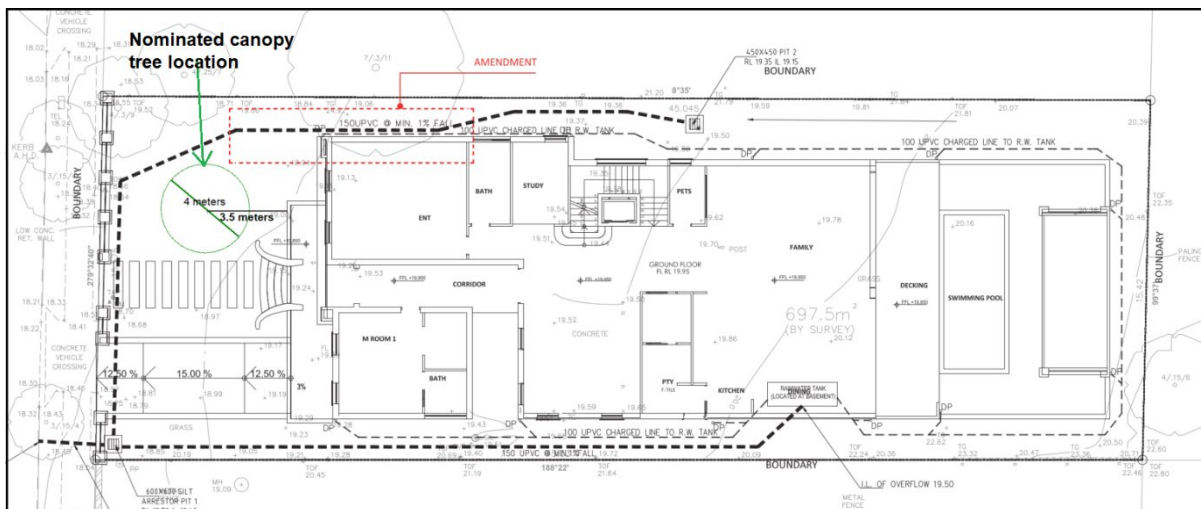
Amended stormwater plan and tree canopy location (marked in green as nominated by Development Assessment Officer)
